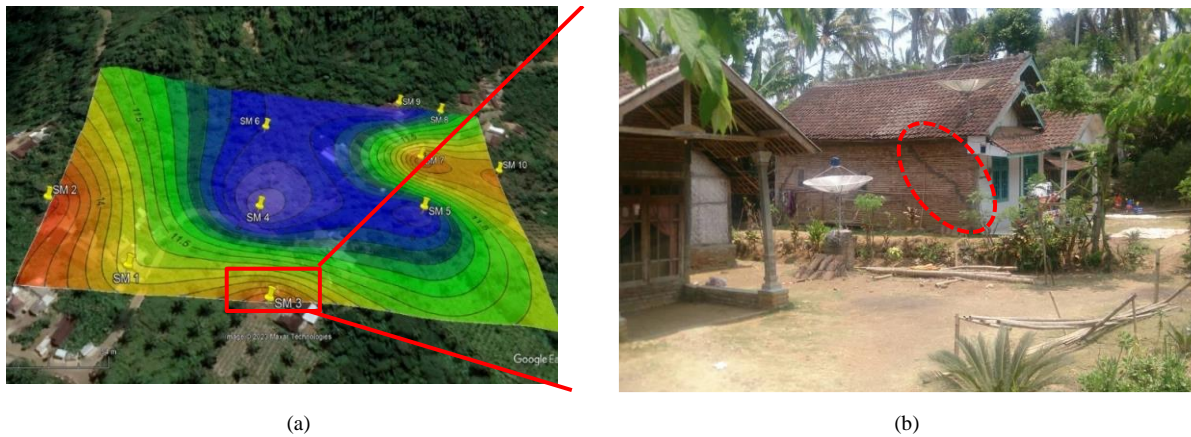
Map showing the locations of houses with wall cracks (5.b.) near point SM 03
